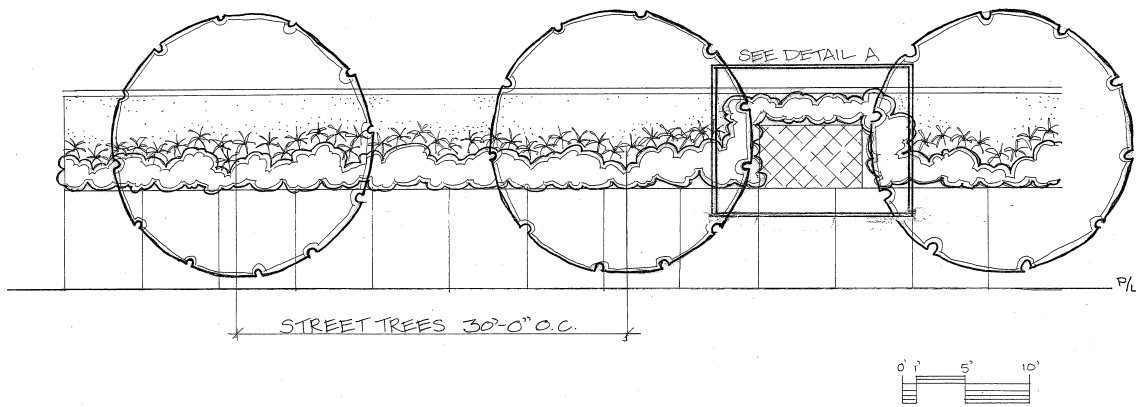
EXHIBIT F: PLAN VIEW SOLEDAD CANYON ROAD CORRIDOR PARKWAY AND SIDEWALK
